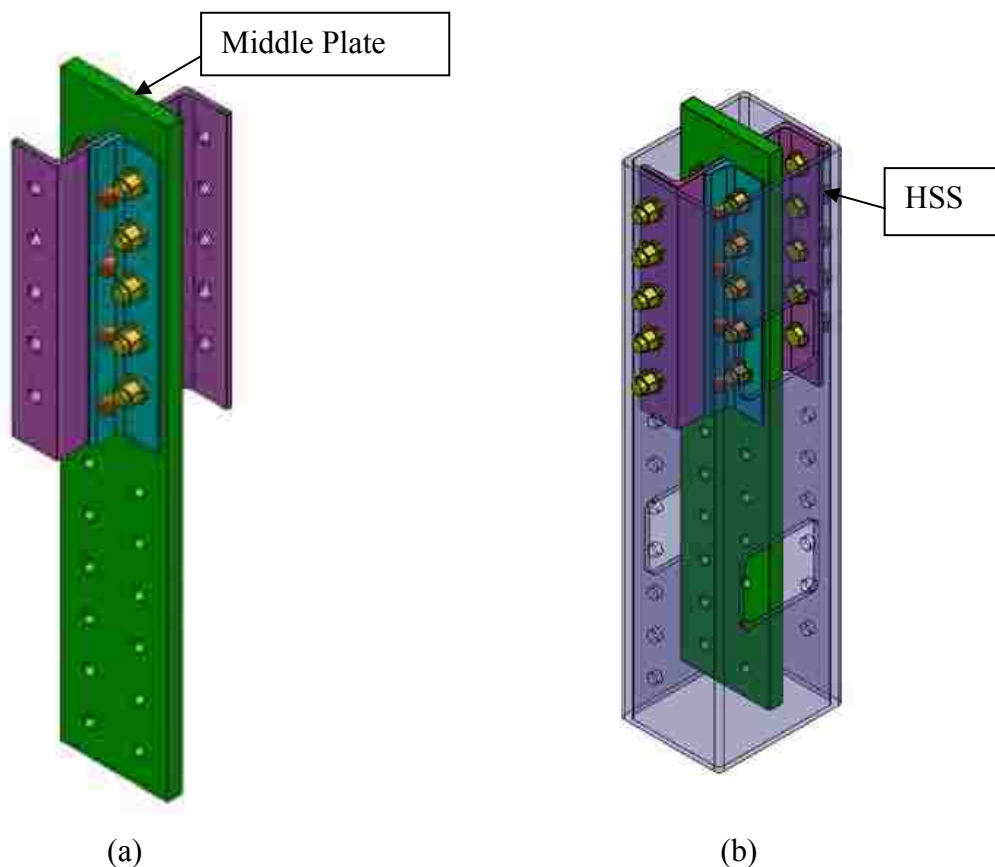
Guardrail Sections Bolted to (a) Middle Plate and (b) Hollow Structural Shape (HSS)
